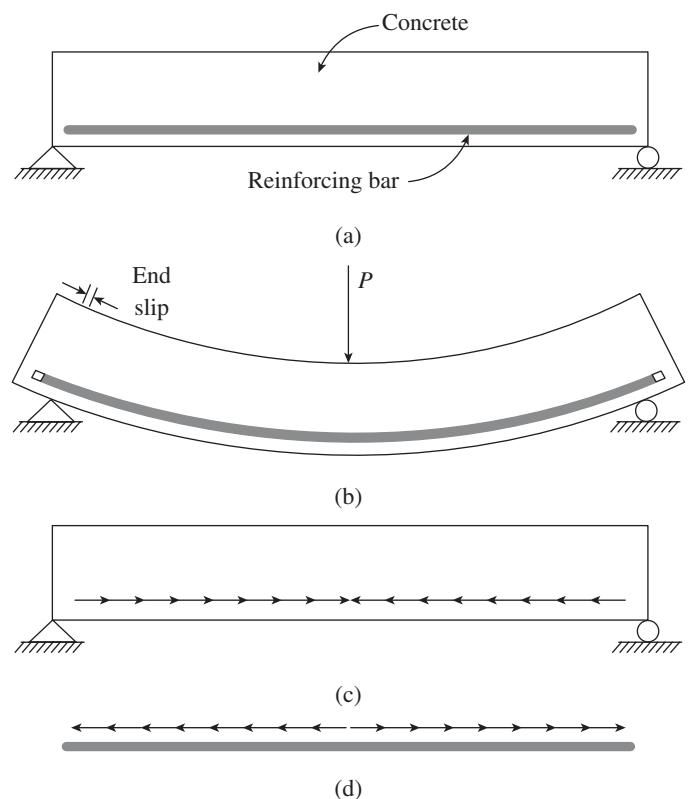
Bond stresses due to flexure (a) Beam before loading (b) Unrestrained slip between steel and concrete (c) Bond forces acting on concrete (d) Bond forces acting on steel
